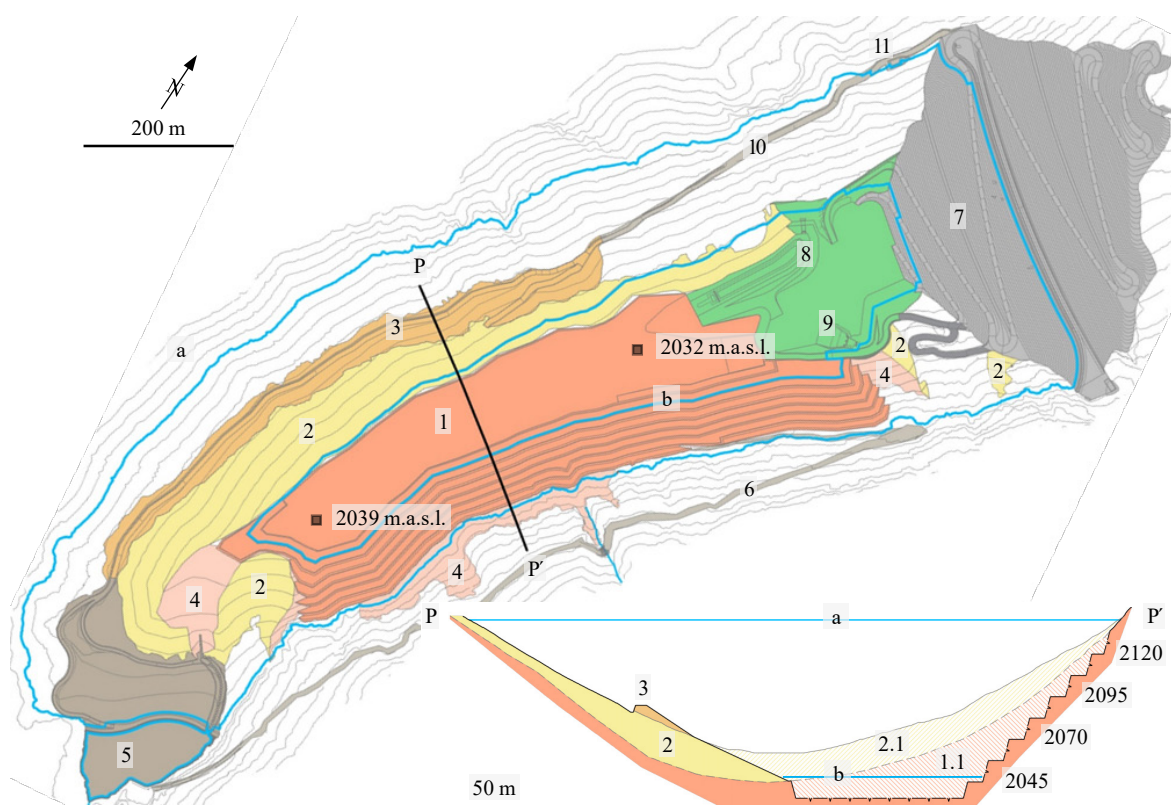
Layout of the reservoir: (1) quarry, (2) soil slopes, (X.1) excavation volume, (3) rockfall protection dam, (4) exposed rock surface, (5) reservoir head, (6) reservoir side path, (7) Kümtai dam, (8) intake bottom outlet, (9) intake/outlet tailrace tunnel, (10) reservoir access road, (11) spillway intake, (a) full supply level - 2140 m.a.s.l. (b) drawdown level - 2049 m.a.s.l.
